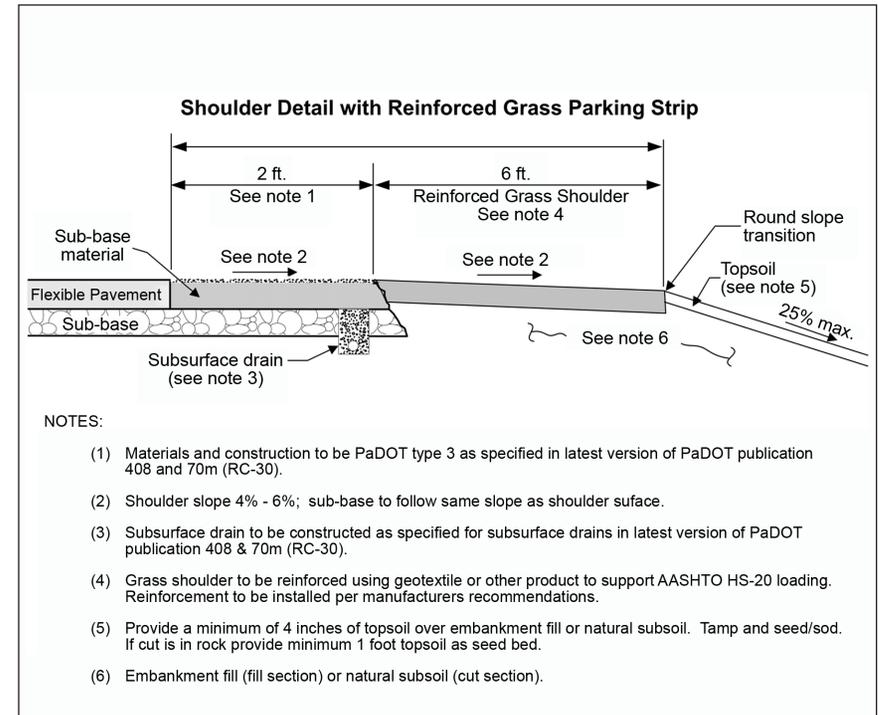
Shoulder Detail with Reinforced Grass Parking Strip
